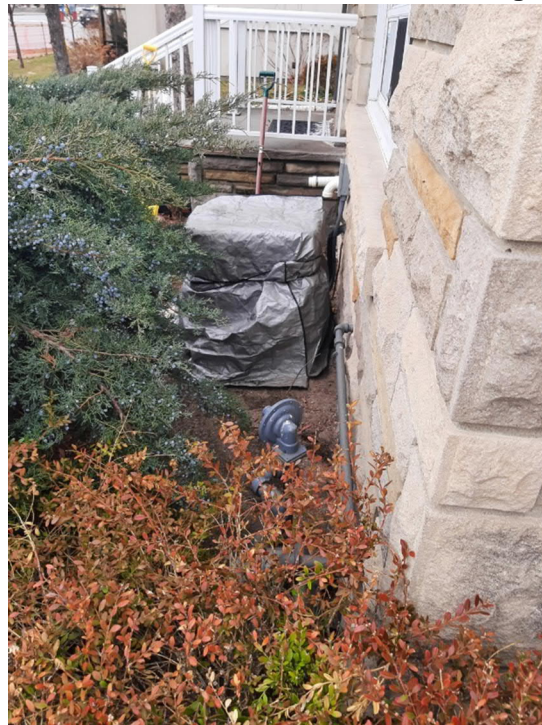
View of the east elevation of the Site building, facing west.
